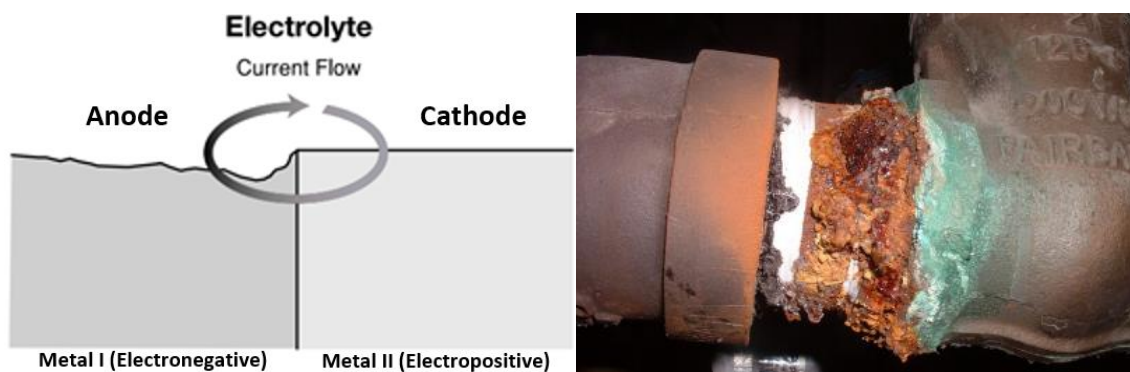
Galvanic corrosion process (left), galvanic corrosion in a pipe joint [28, 29]
